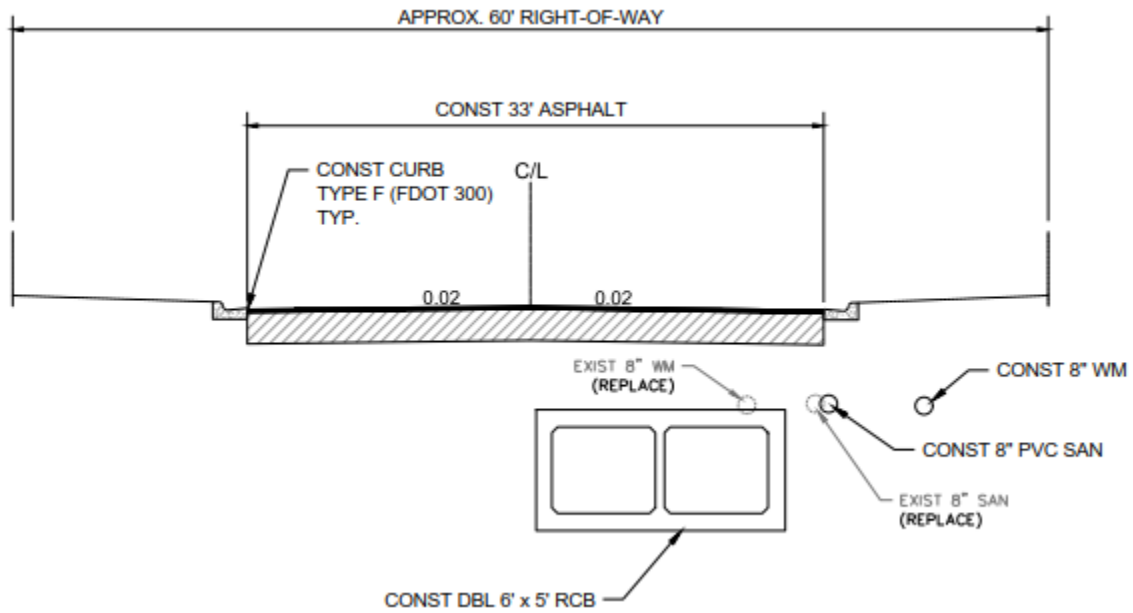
Rome Avenue south of Gray Street Typical Section (NTS)
